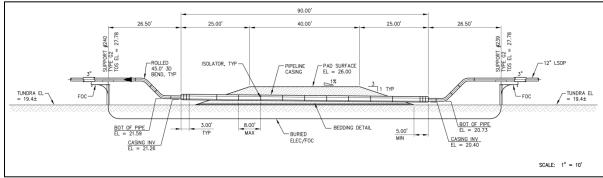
Badami Ice Road Crossing Pad, Section View
